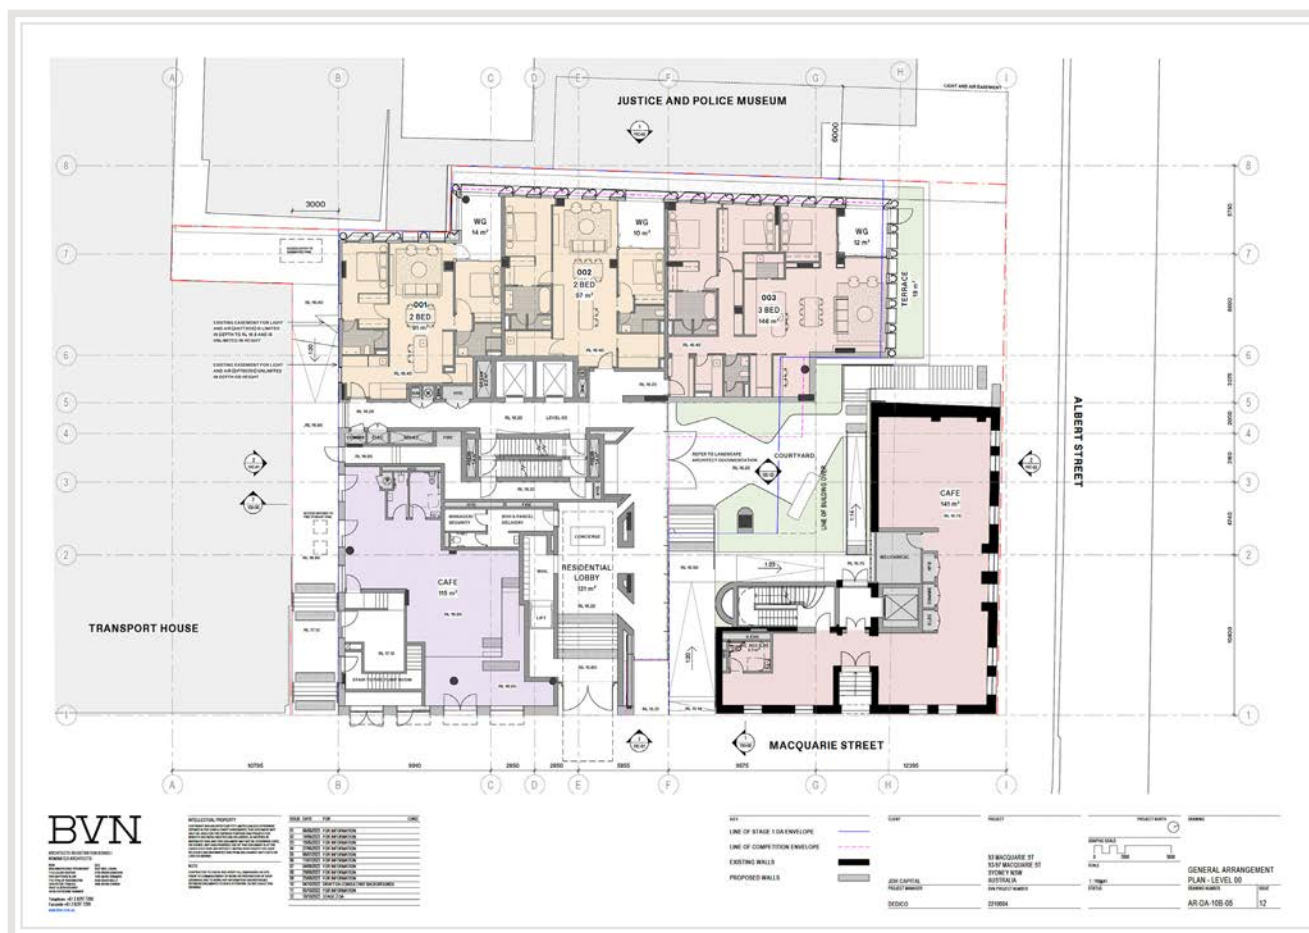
Typical floor plan of the proposed design by BVN Architects.
